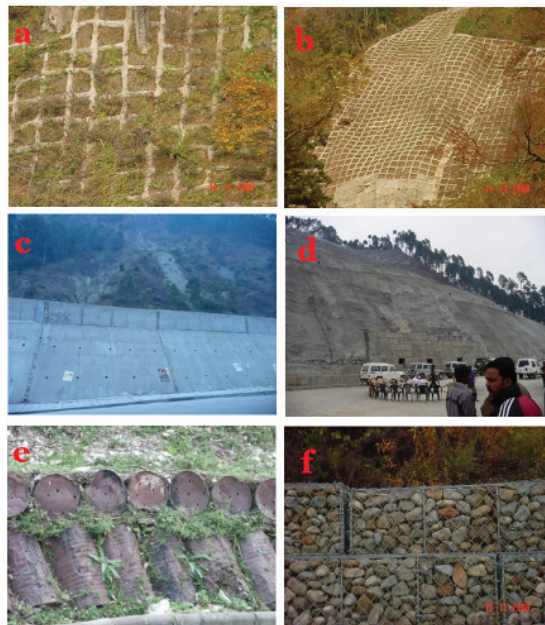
(a, b) Slope stitching technique for preventing surficial failures, (c) Block masonry retaining wall with weep holes, (d) Multiple remedial measures for stabilizing landslide site, (e) Empty bitumen drums filled act as retaining wall, (f) Random Boulder Gabion Wall debris with wire crates (Prakash, 2019)
